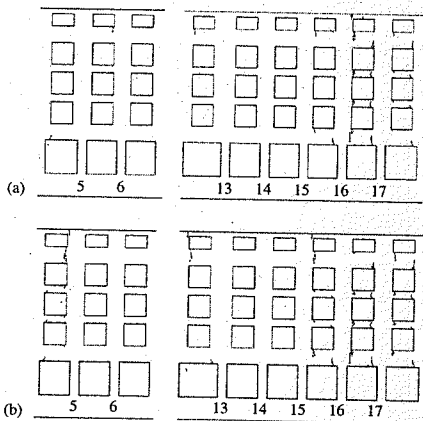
Fully open cracks for the anchored façade before (a) and after (b) the jump in the maximum crack width.
